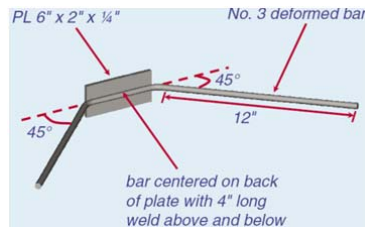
details and dimensions of the hairpin connector (2 in. flanges)
